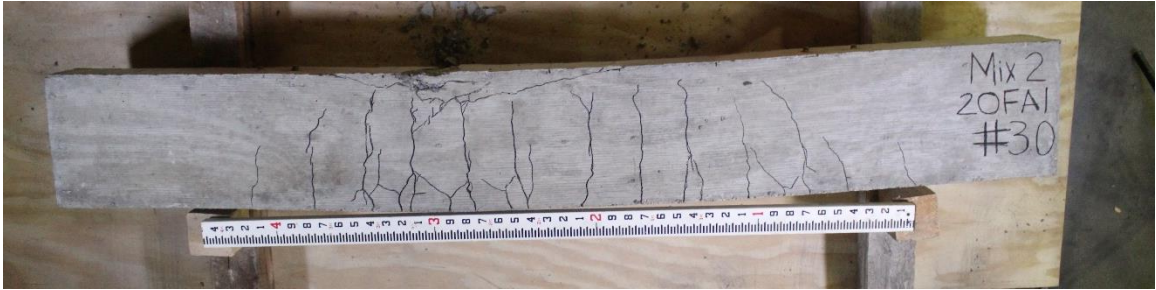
Mixture 2 (20FA1) beam #30: concrete beam side view.
